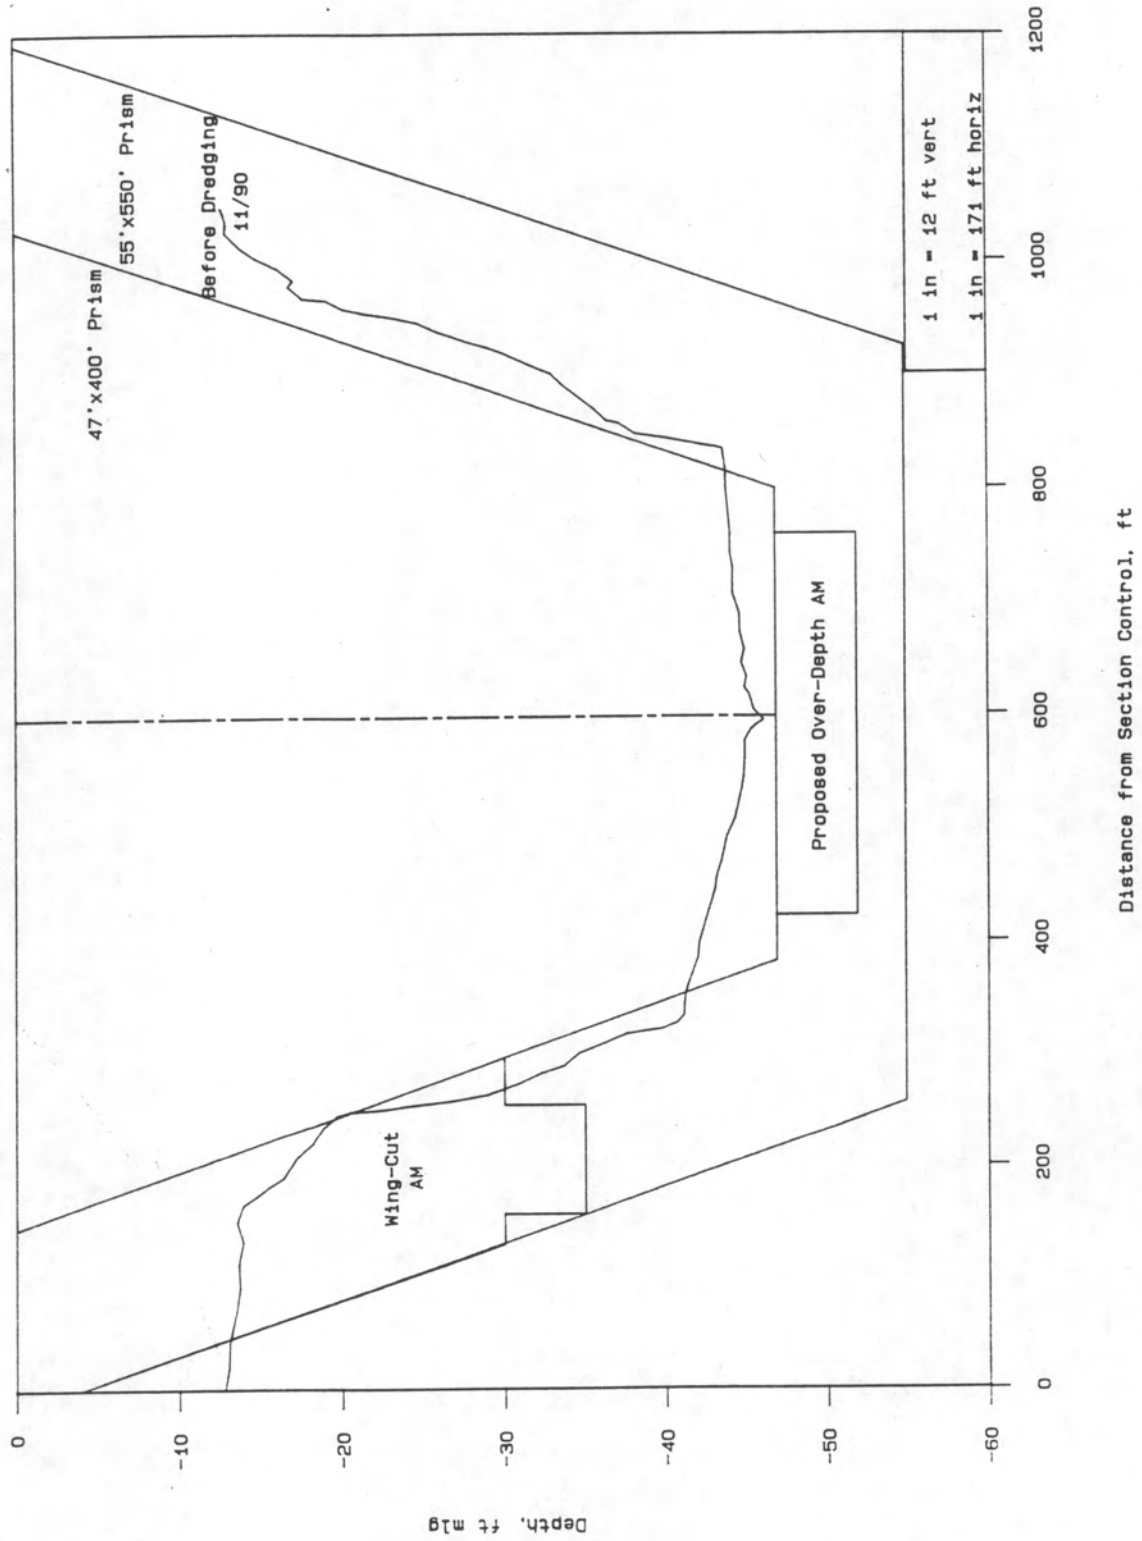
Typical section of the proposed test reach between Stations 880+00 and 935+00
